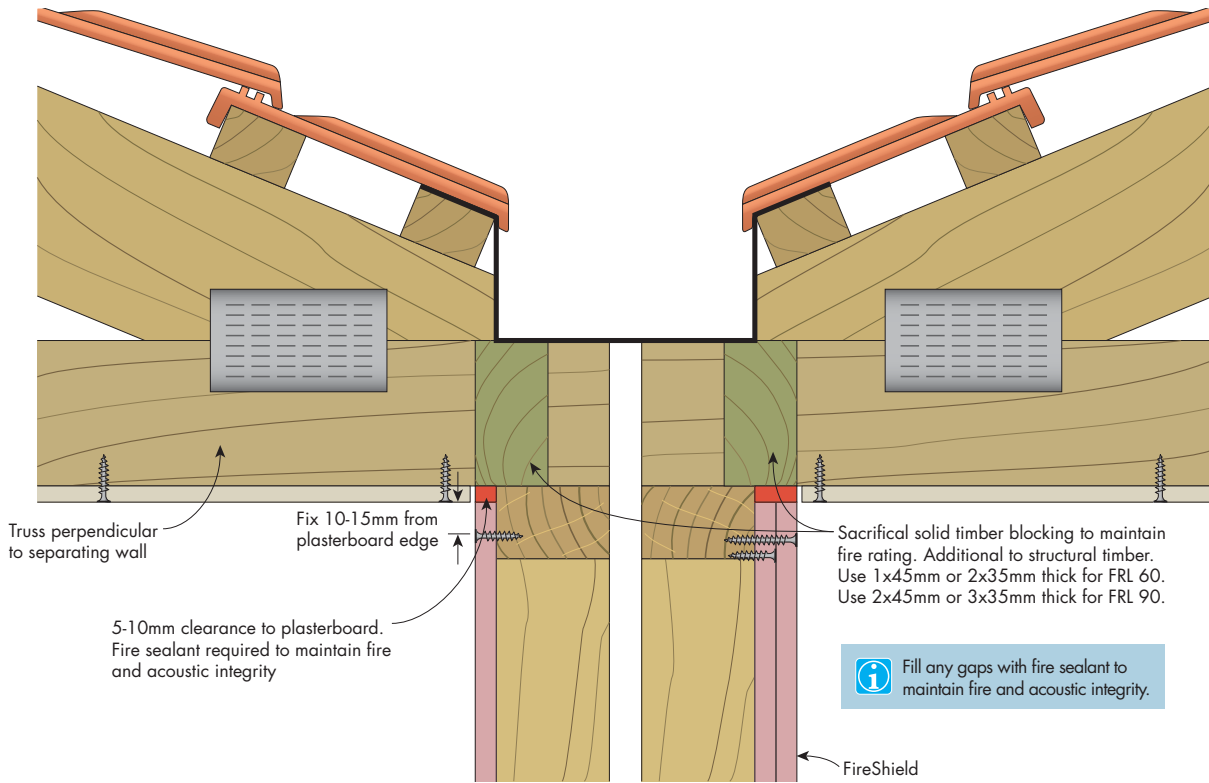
Separating Wall to Box Gutter with Perpendicular Roof Trusses
